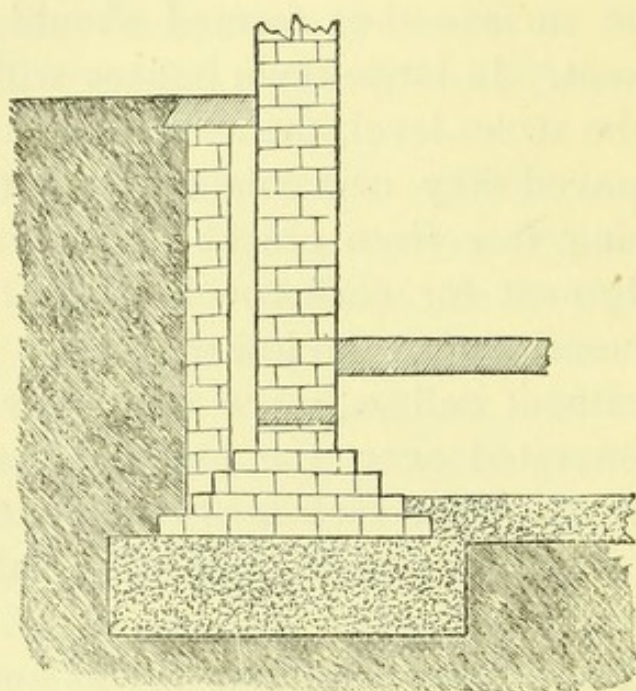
House-foundation with damp-proof course in wall and dry area.
